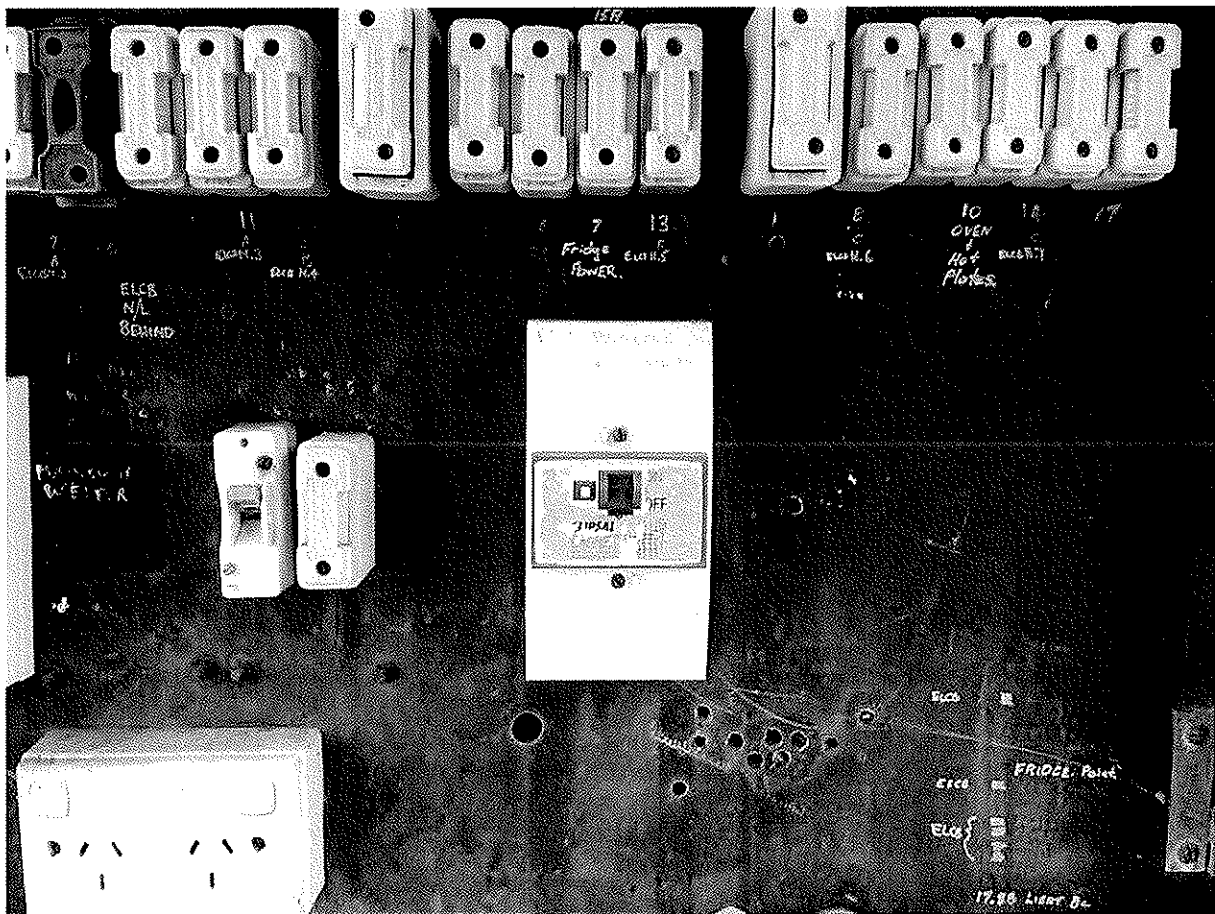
A suspected 'zelemite' electrical backing board on the western exterior wall of the vacant residence.
